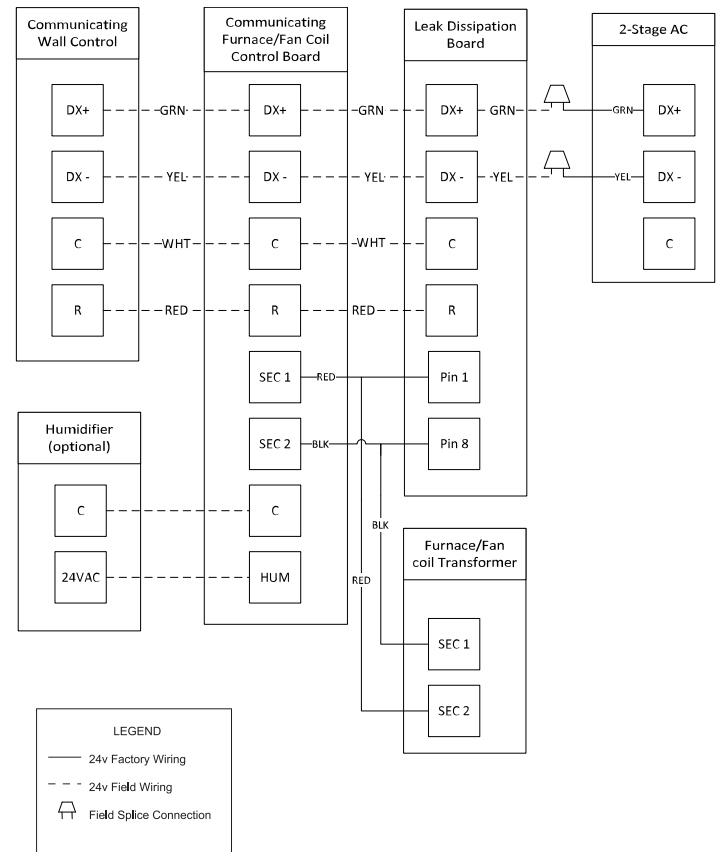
Thermostat Wiring with Communicating Furnace/Fan Coil Control, Leak Dissipation Board and 2-Stage AC
